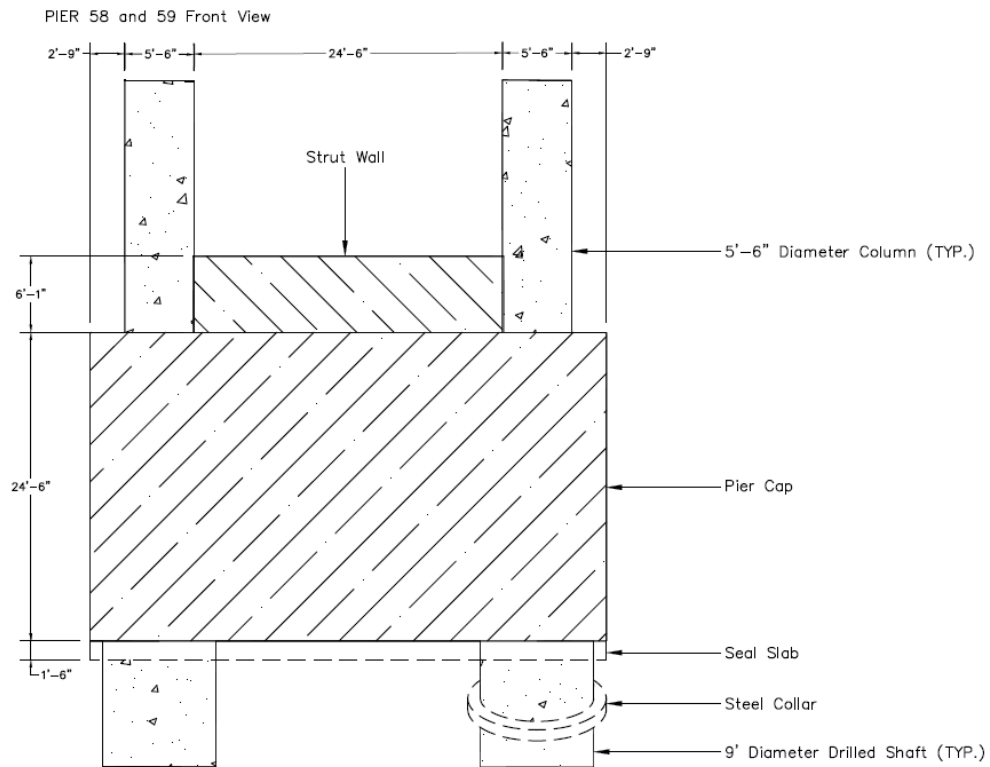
Front view of Pier 58 with seal slab and observed steel collar around shaft 2.
